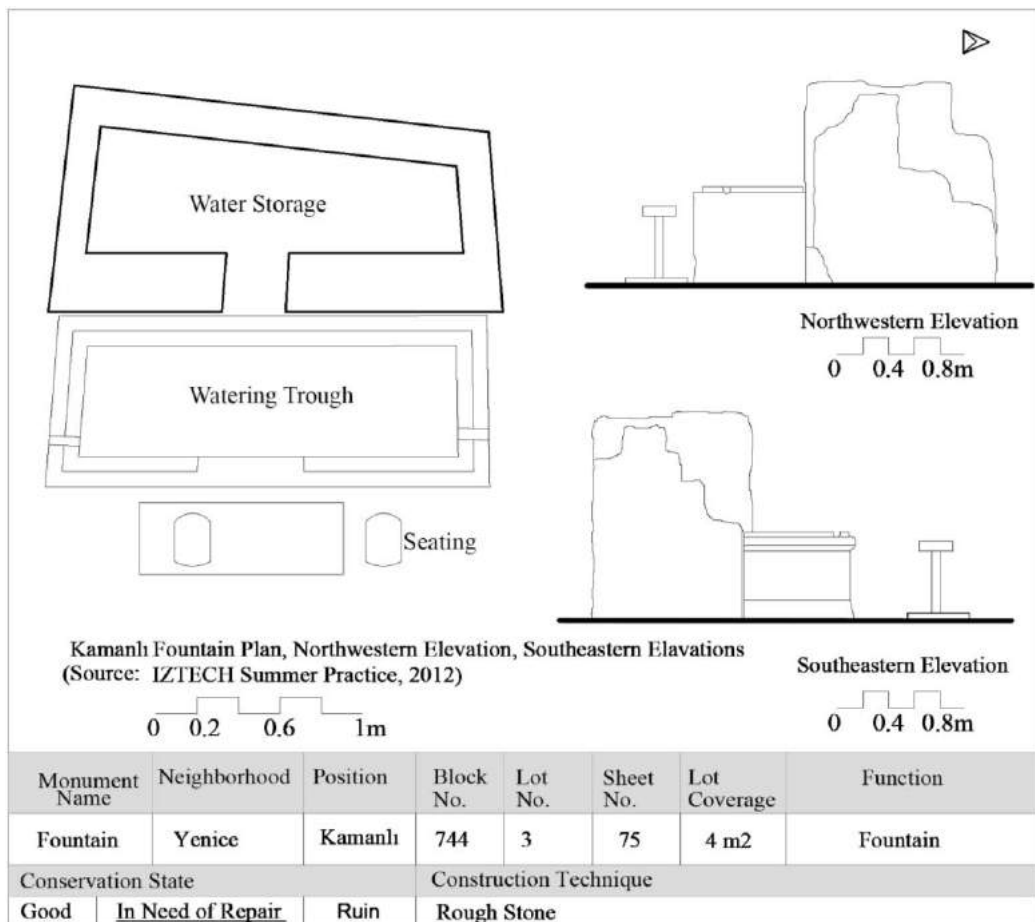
Ground floor plan and elevations, Kamanlı mosque fountain
